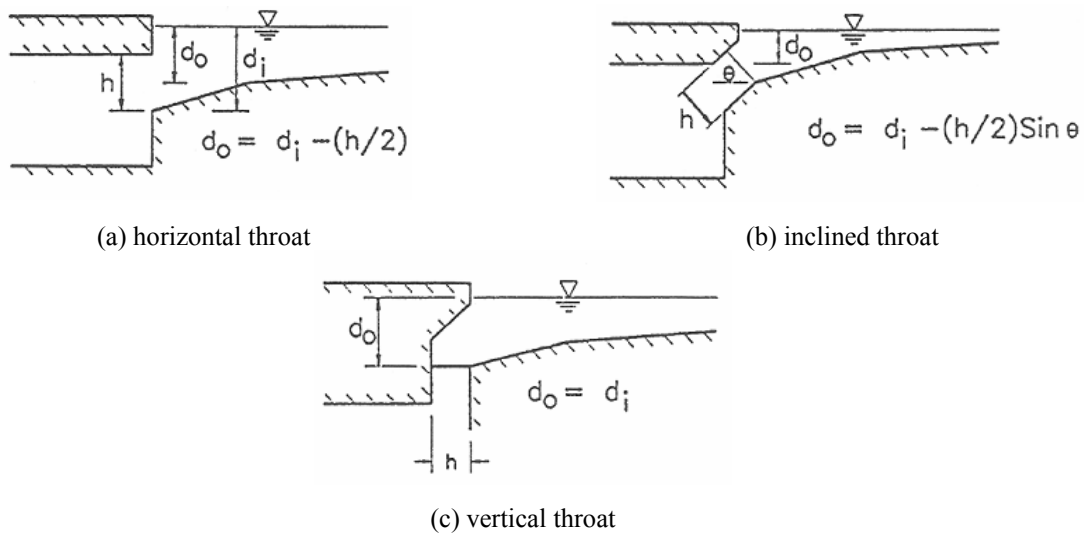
Curb inlet openings types (UDFCD, 2008)
